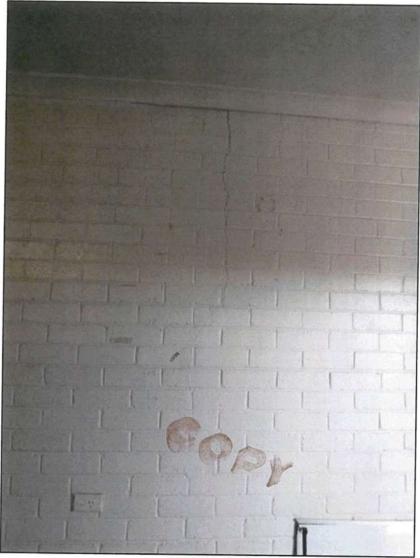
Cracking on the eastern wall was up to 20mm wide.
